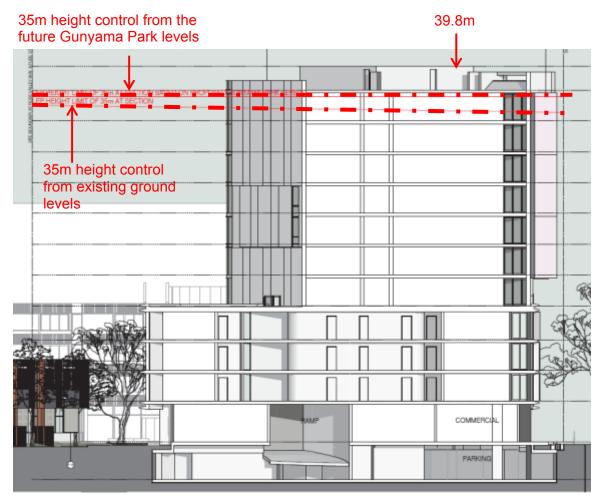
Proposed Building A demonstrating breach of 35m height control
